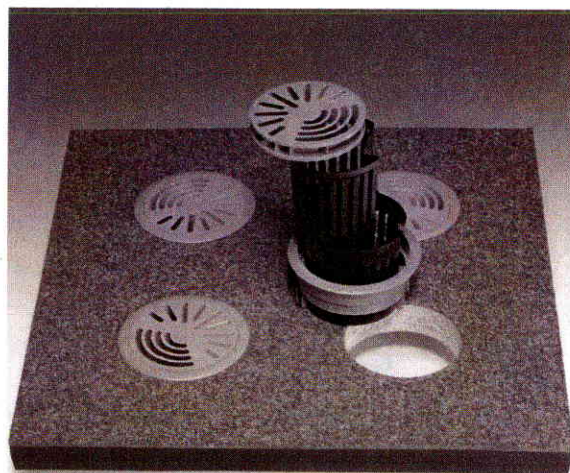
Rotary floor twist outlet with clamp insert for installation in through bore of floor tile,
